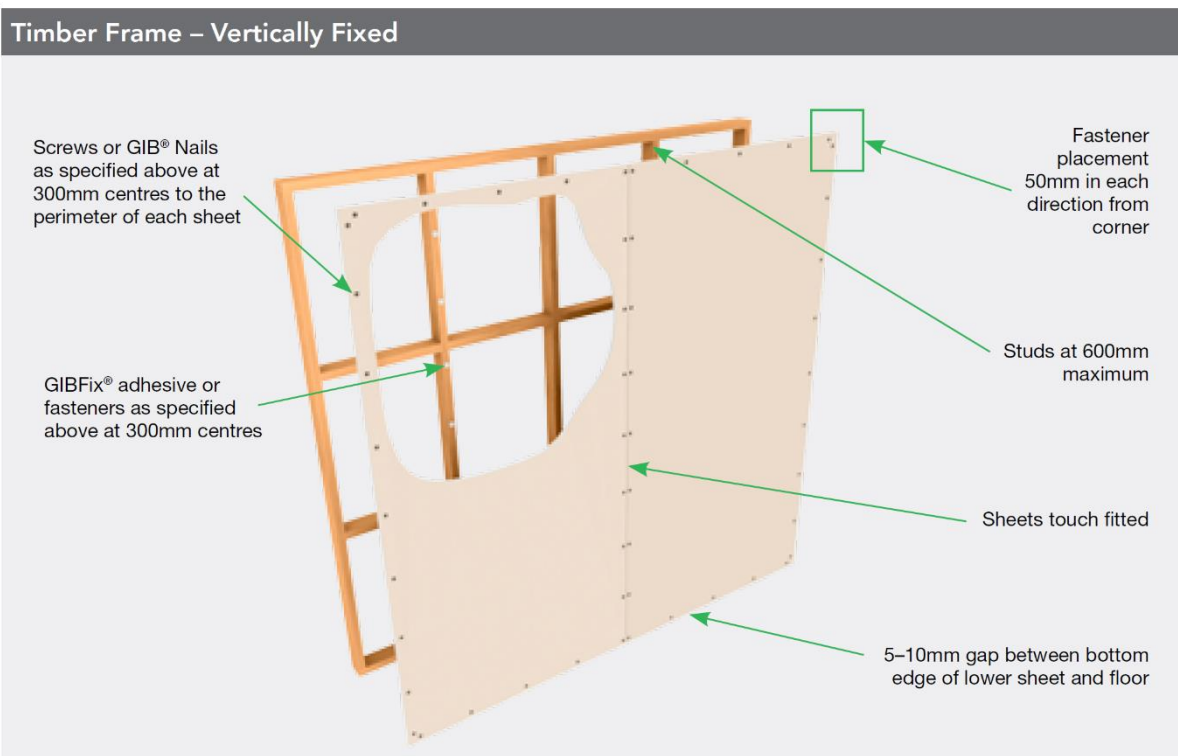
Typical New Zealand timber framed residential partition wall as per GIB® Site Guide (2014)
